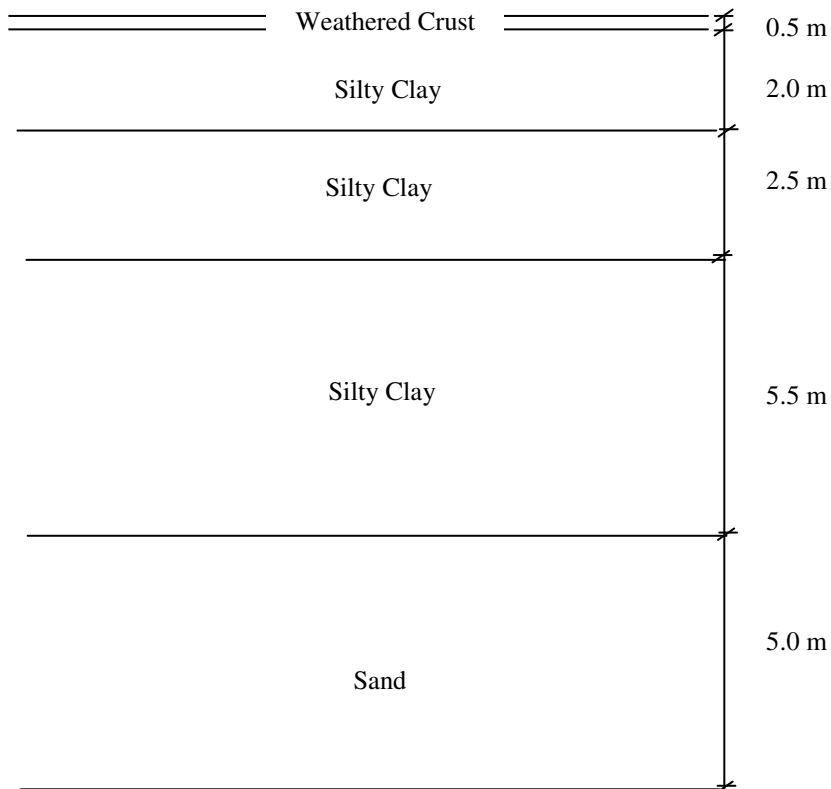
Typical Soil Profile of Site C (Sunshine Coast)
